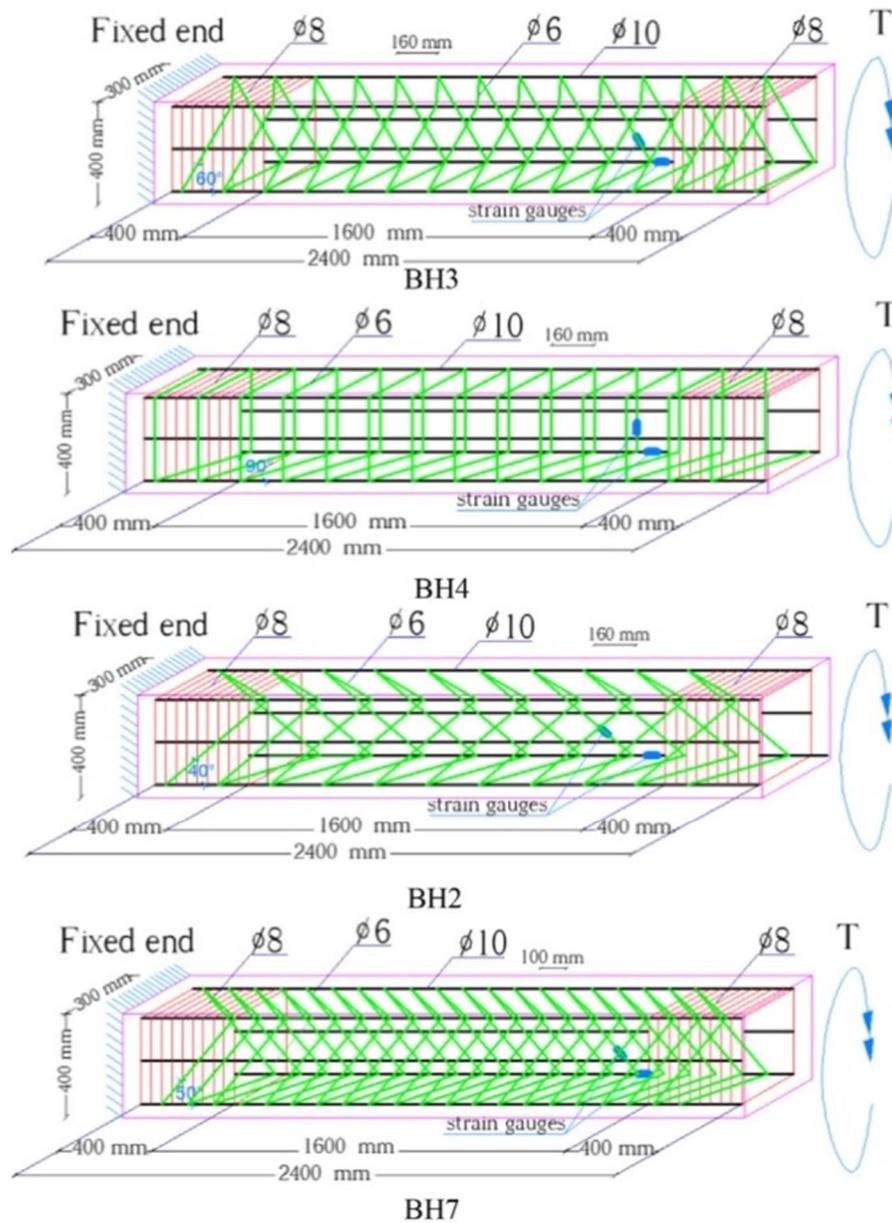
Dimensions and reinforcement details of the tested beam by Ahmed et. al. (2020).
